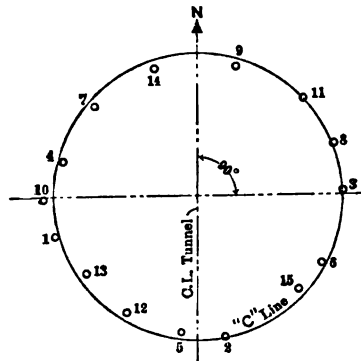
Drill Holes Grouted at Shaft 24. Elevation — 230.
